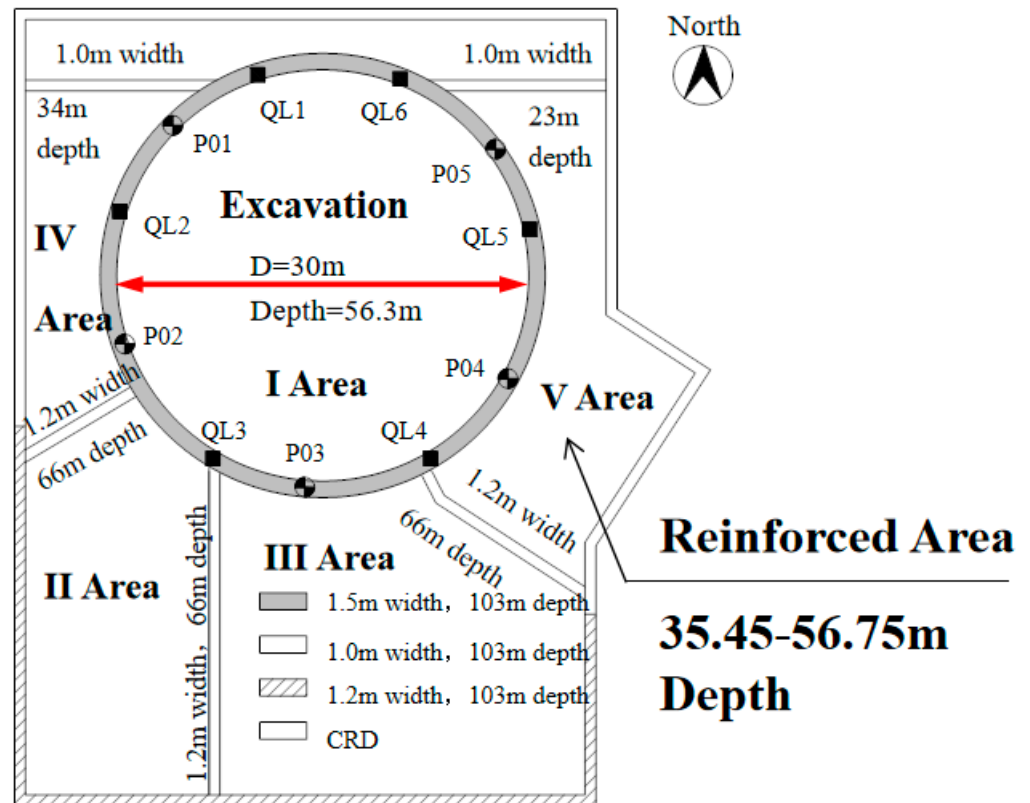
Layout of measurement points and structural parameters for deep foundation pit engineering in Miaopu.
